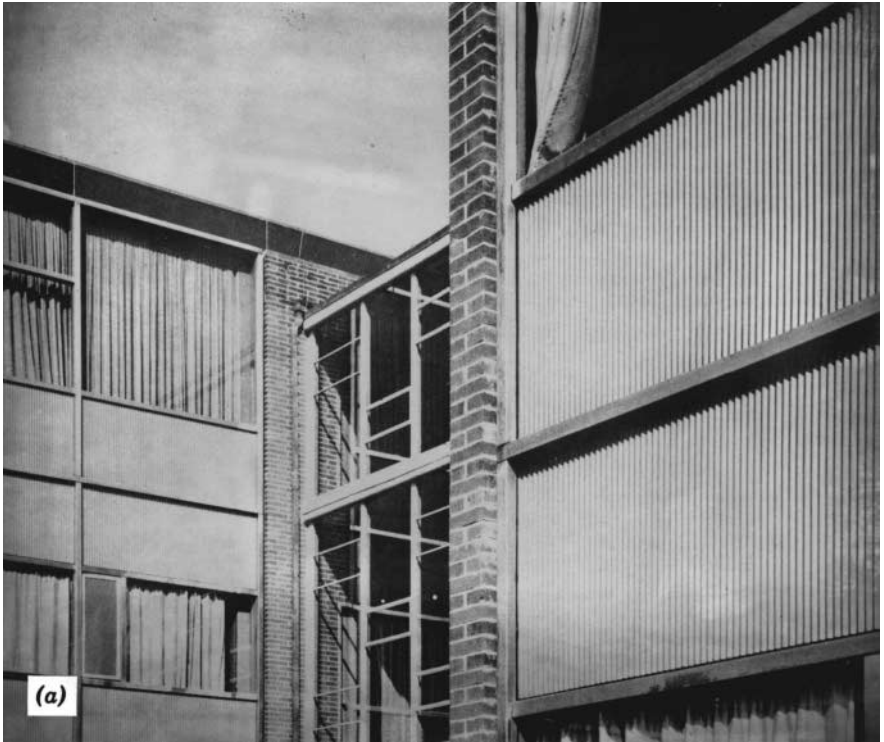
(a) Exterior curtain wall panels employing corrugated steel sheets.^{1.87}
